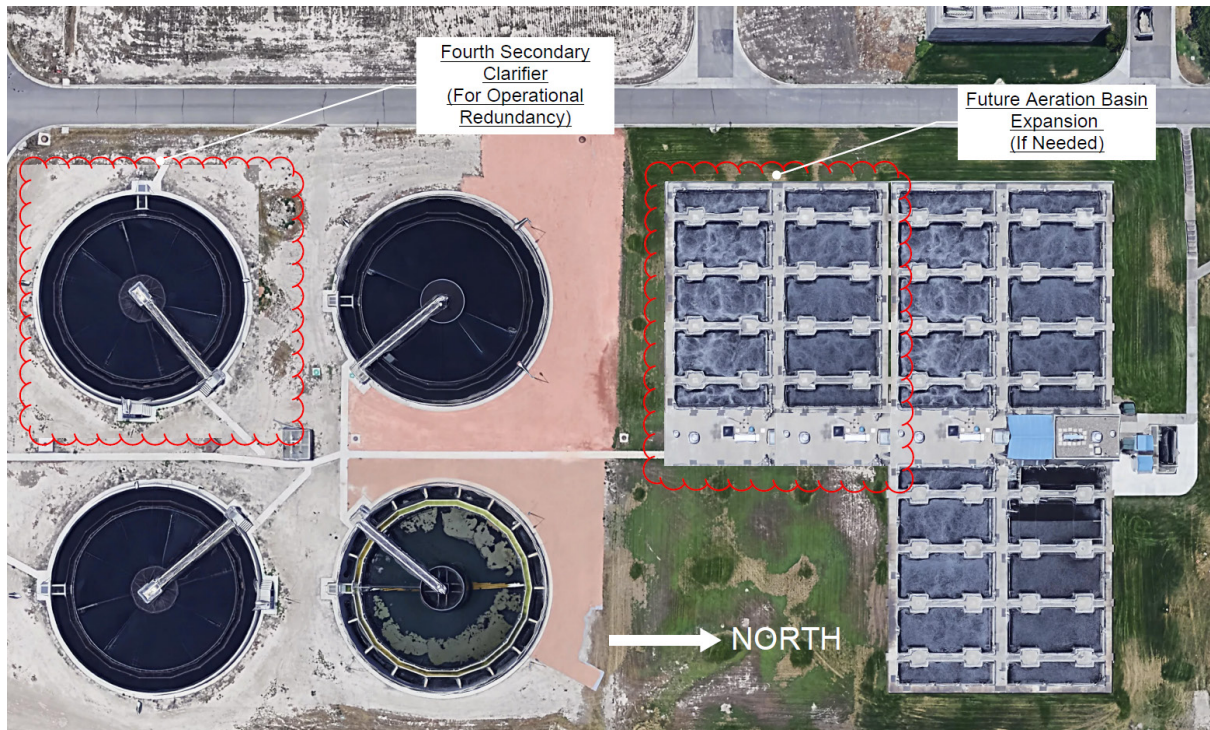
Site Layout of Secondary Treatment Baseline Alternatives
